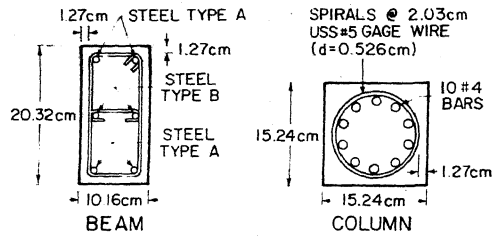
TEST SPECIMEN AND TESTING ARRANGEMENT
